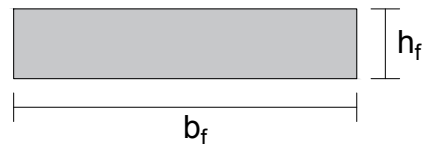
Cross-sectional view of the massive floor girder in x-direction
